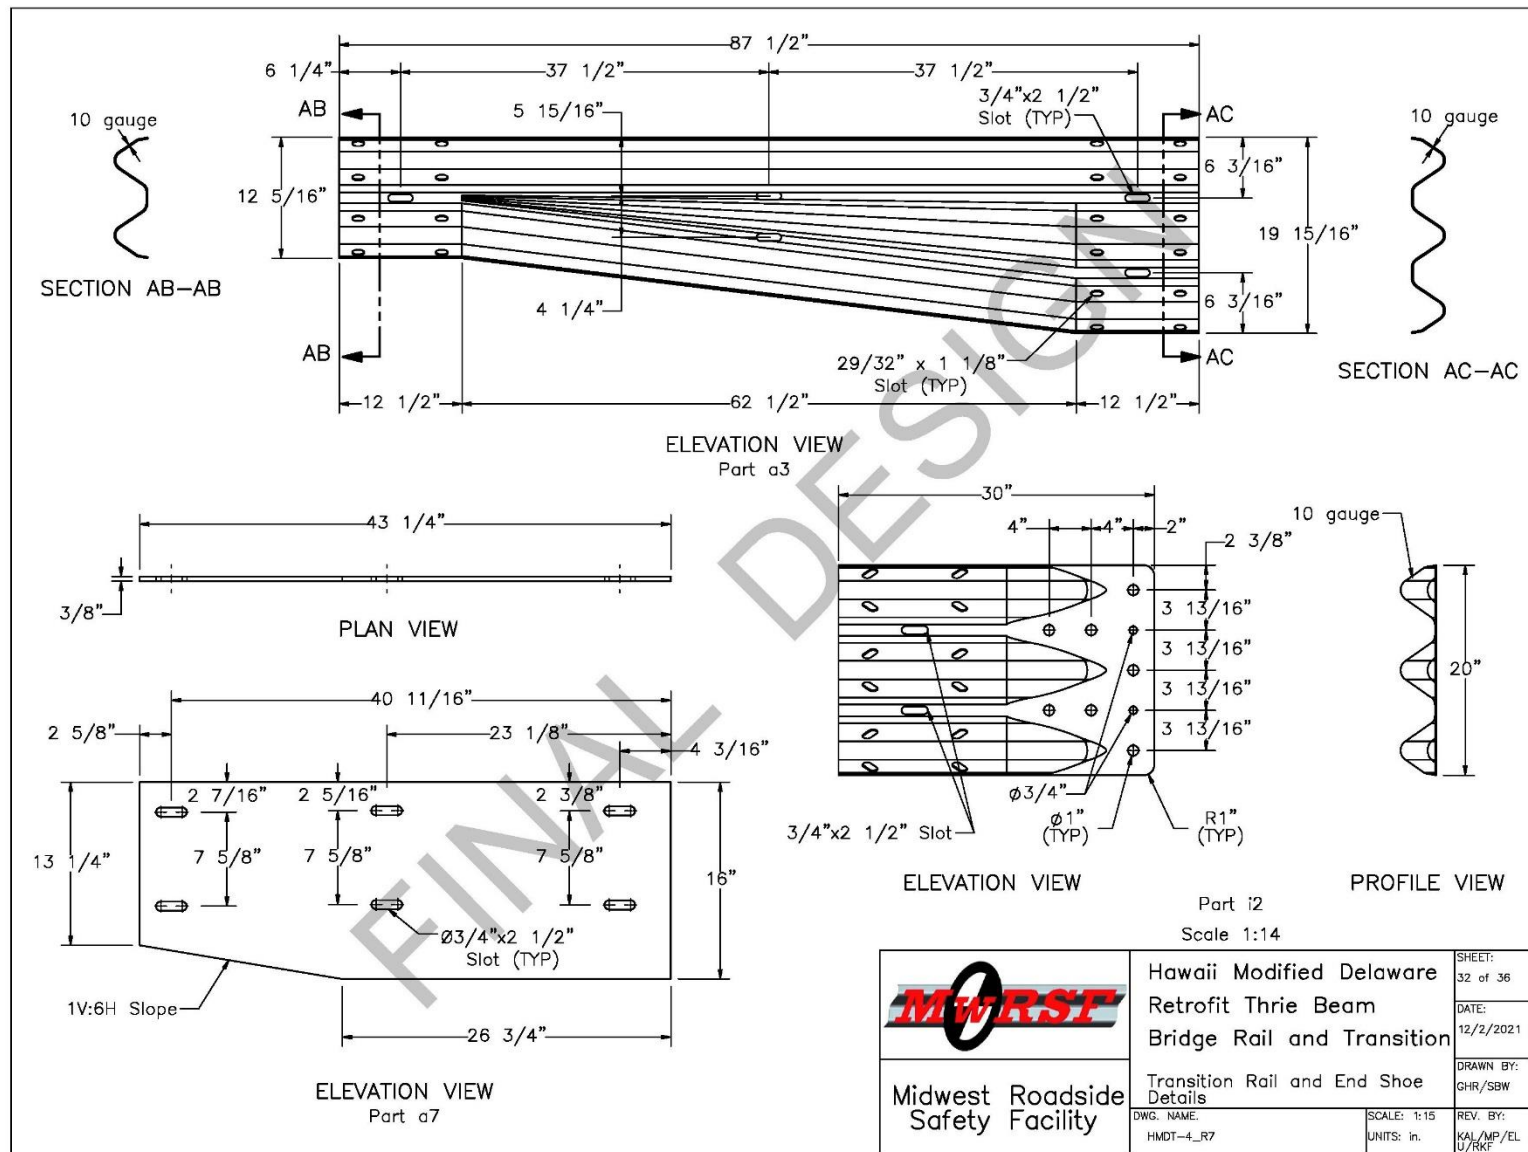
Transition Rail and End Shoe Details, Test No. HMDT-4
